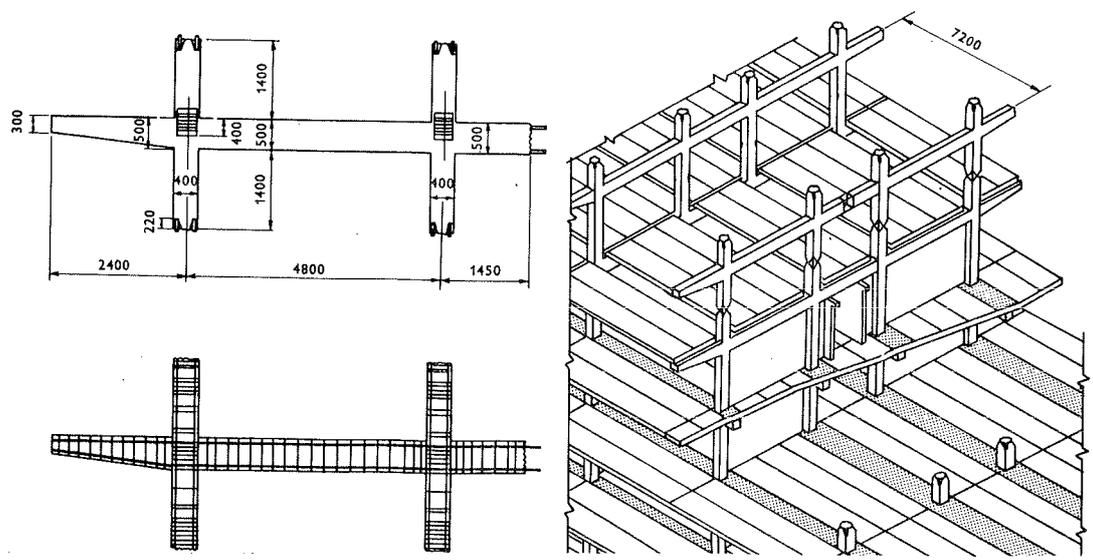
CONVENIENT LOCATIONS OF JOINTS FOR PRECAST ELEMENTS [150]
